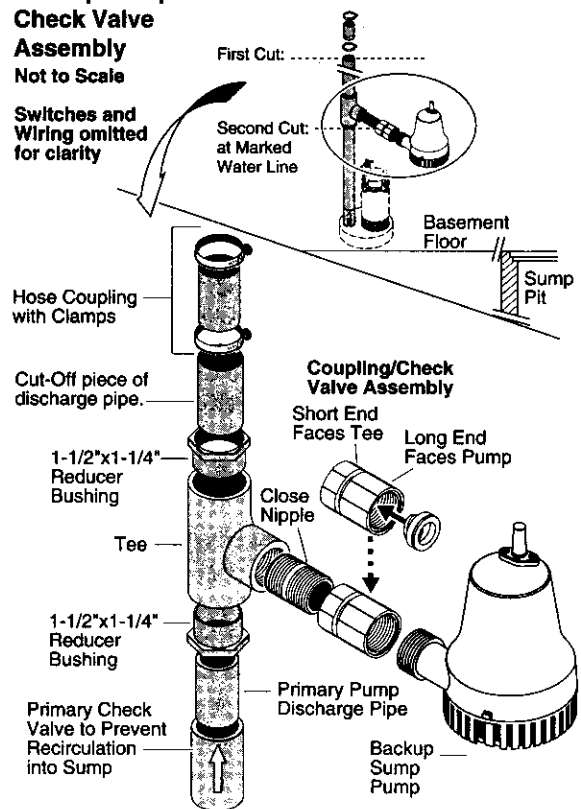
Make the second cut for installation of the backup pump and check valve assembly. Install the backup pump. Your installation may not require the reducer bushings.
